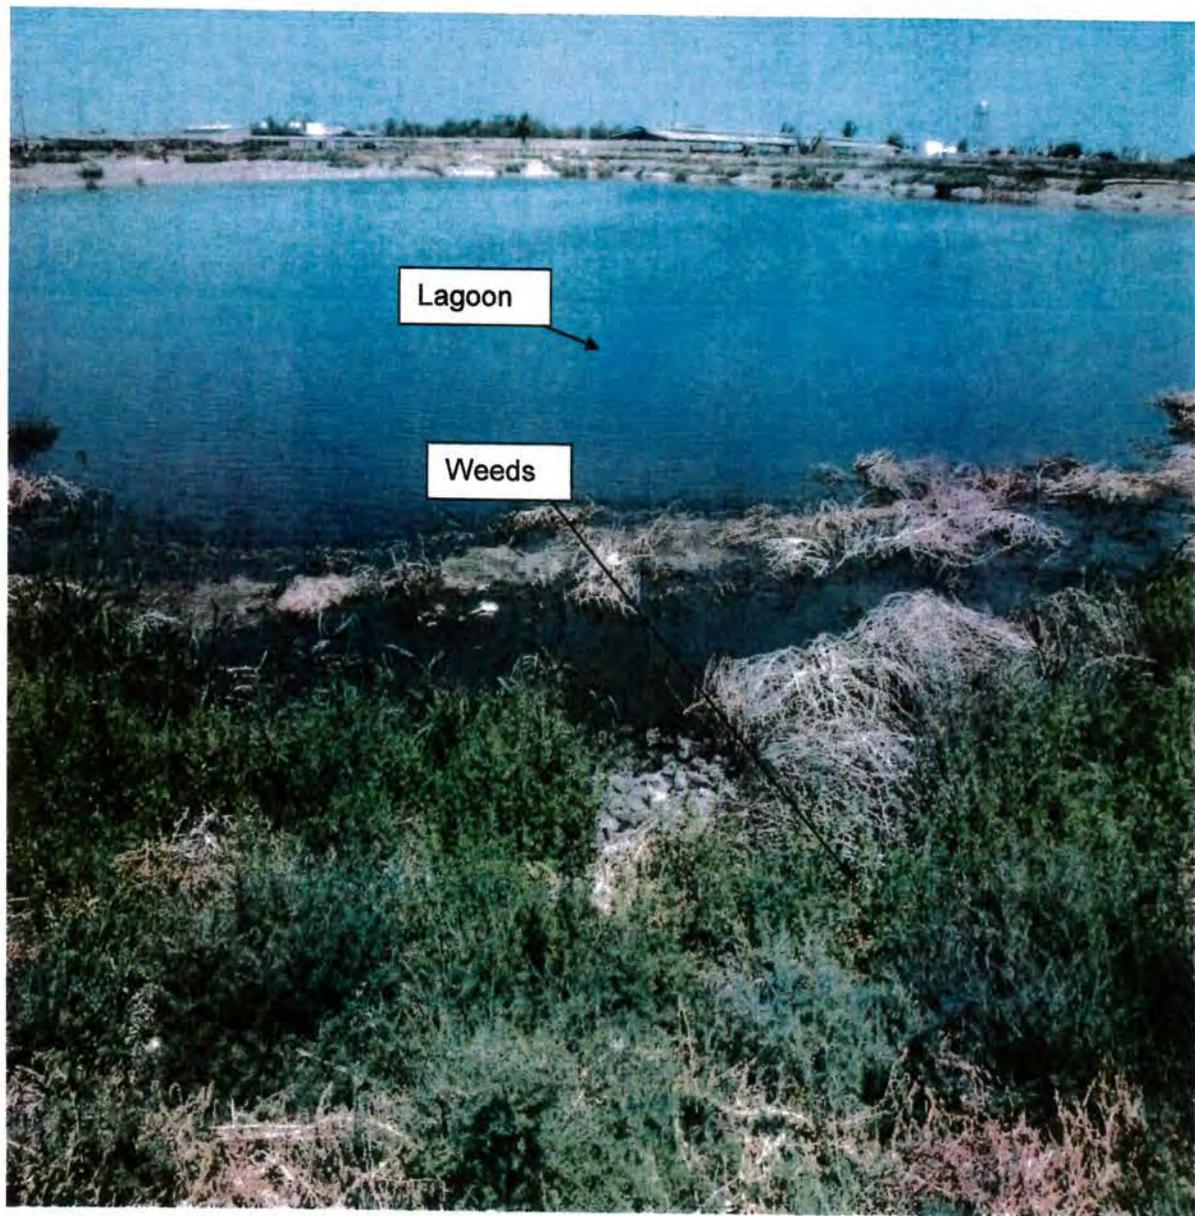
Photo of a lagoon with excessive vegetation on its inner and outer embankments.
